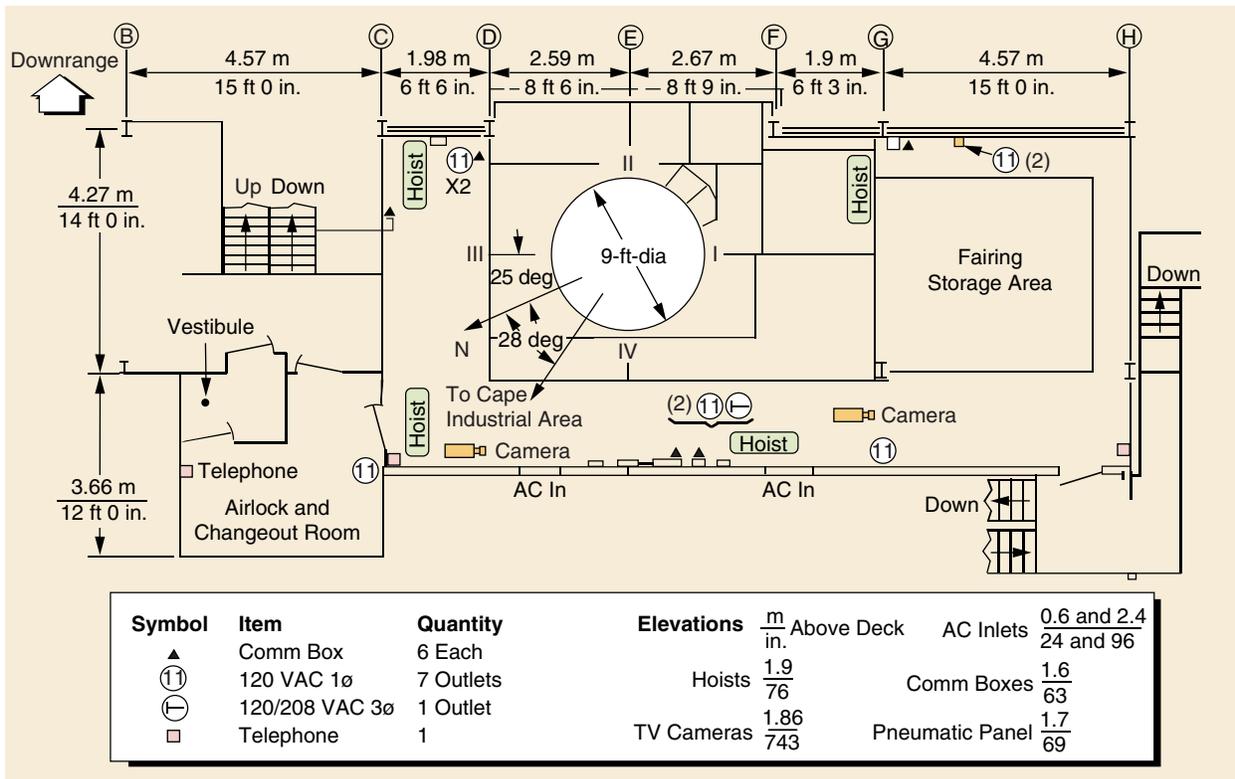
A. Level 9A Floor Plan, Pad 17A
